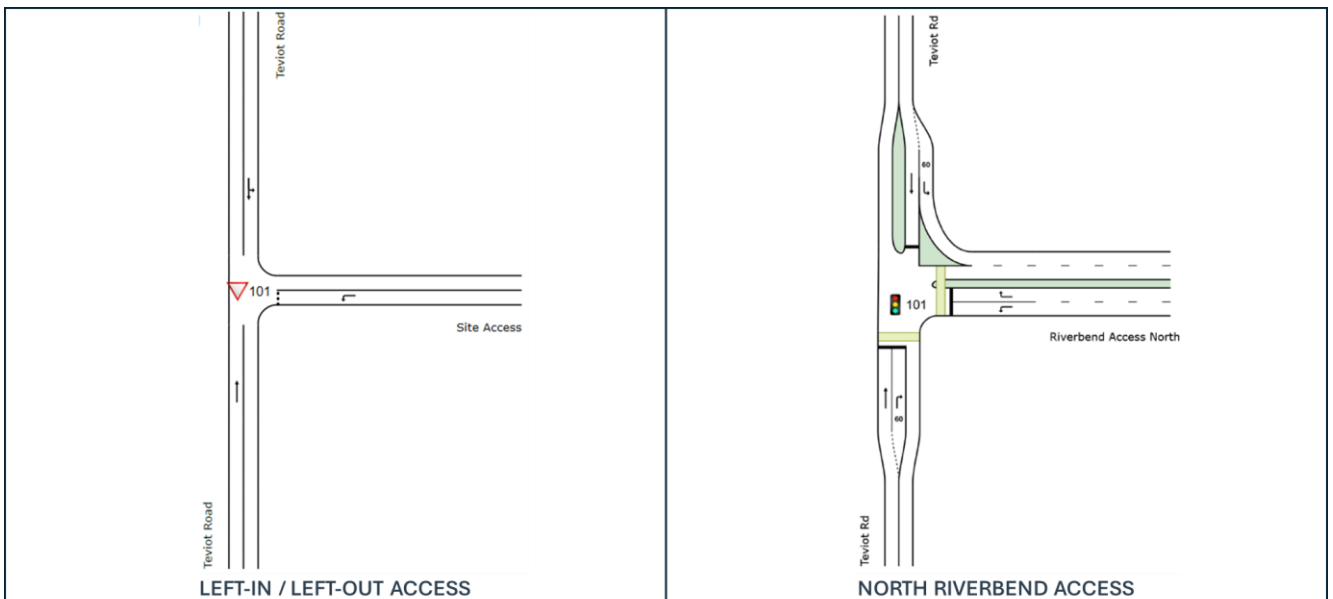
2030 Left-In / Left-Out and North Riverbend Access Layout (Source: SIDRA, Goodrock, PSA)
